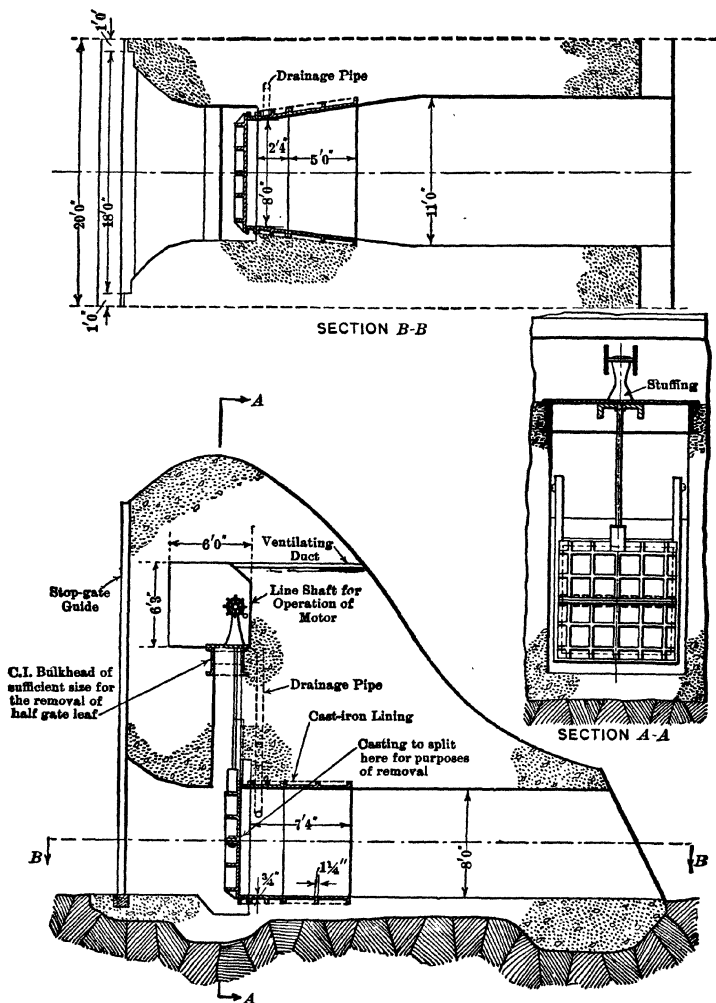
Arrangement of 8 × 8-ft. Sluice Gates, Stevens Creek Development on Savannah River.
